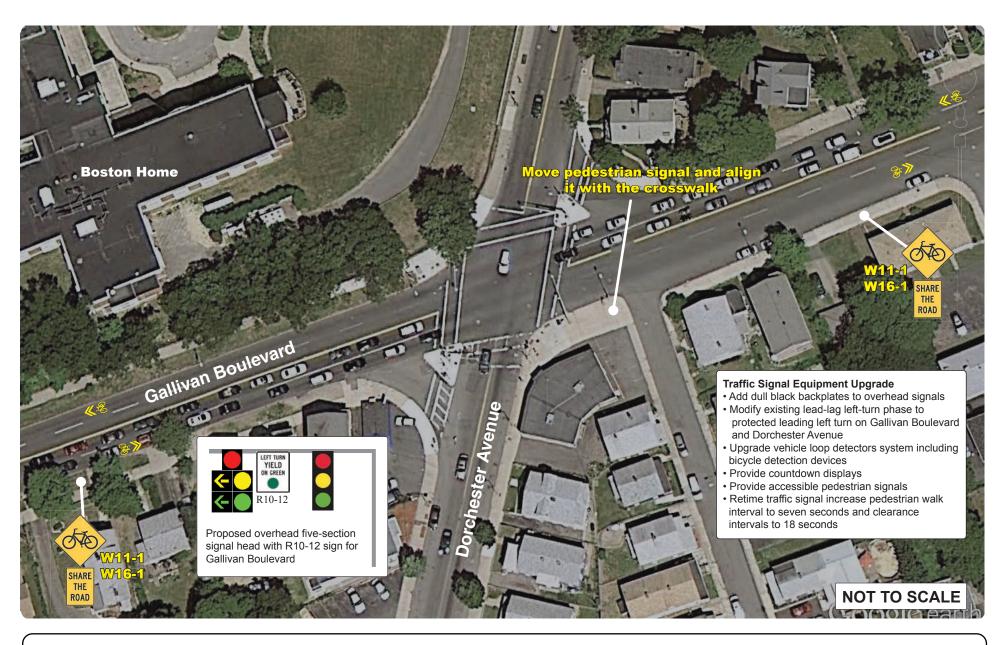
Proposed Improvements at Gallivan Boulevard and Dorchester Avenue Intersection
